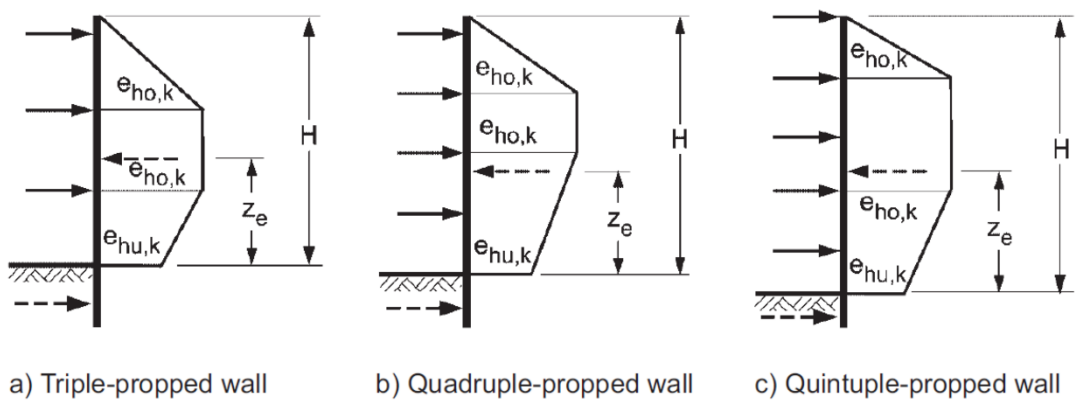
Pressure diagrams for triple- and multiple-supported sheet pile and concrete walls after EAB (2014)
